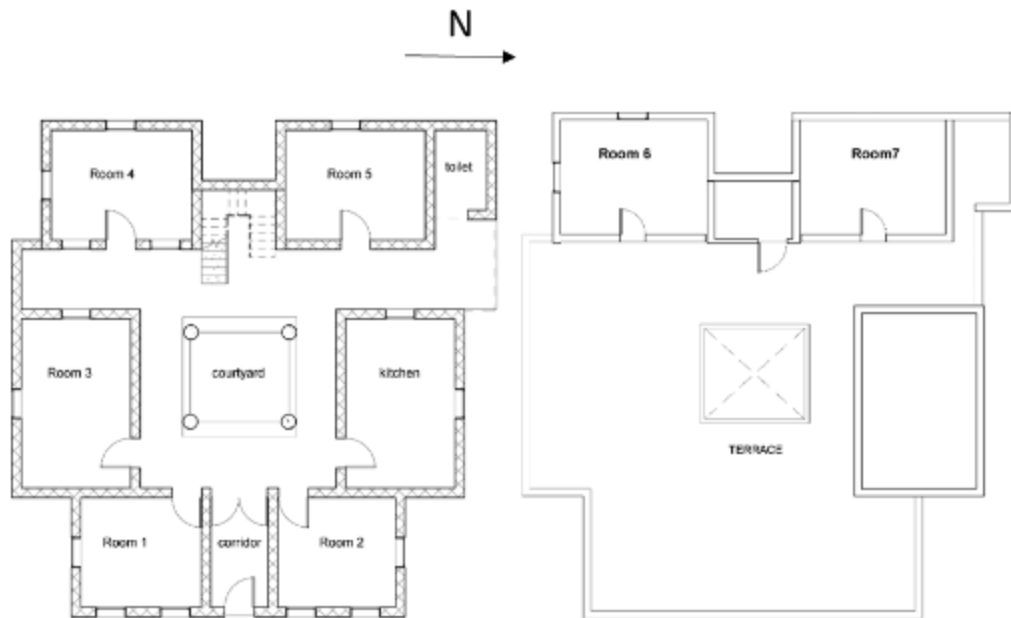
Floor plan of house 2. Ground floor (left), first floor (right).
